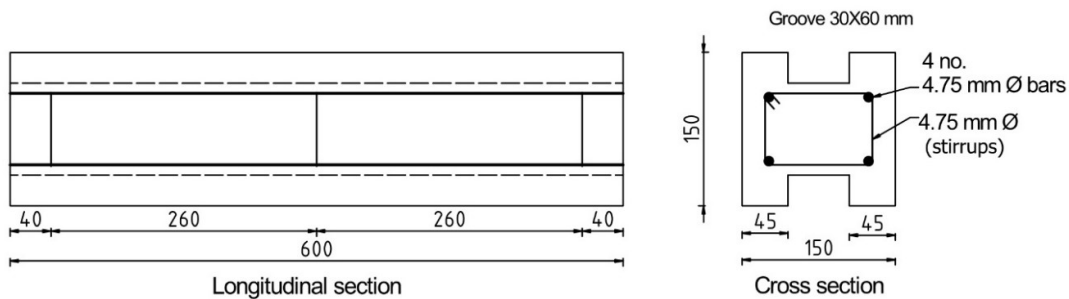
Groove and longitudinal reinforcement in H-posts (all dimensions are in mm)
